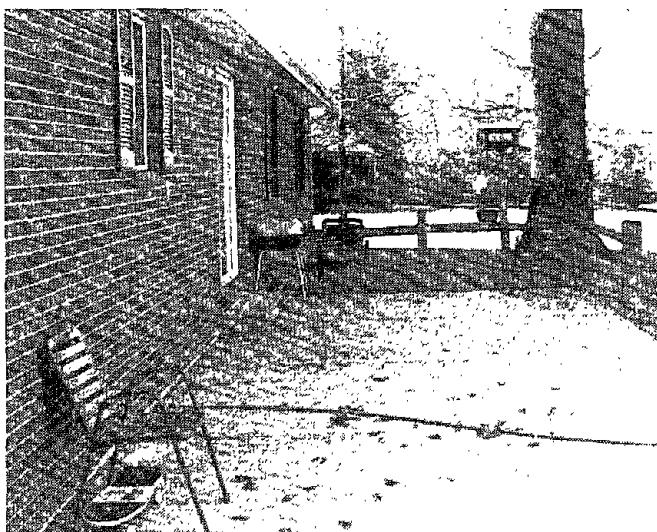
Uncovered patio at house 201 with tilt toward house's north wall.
